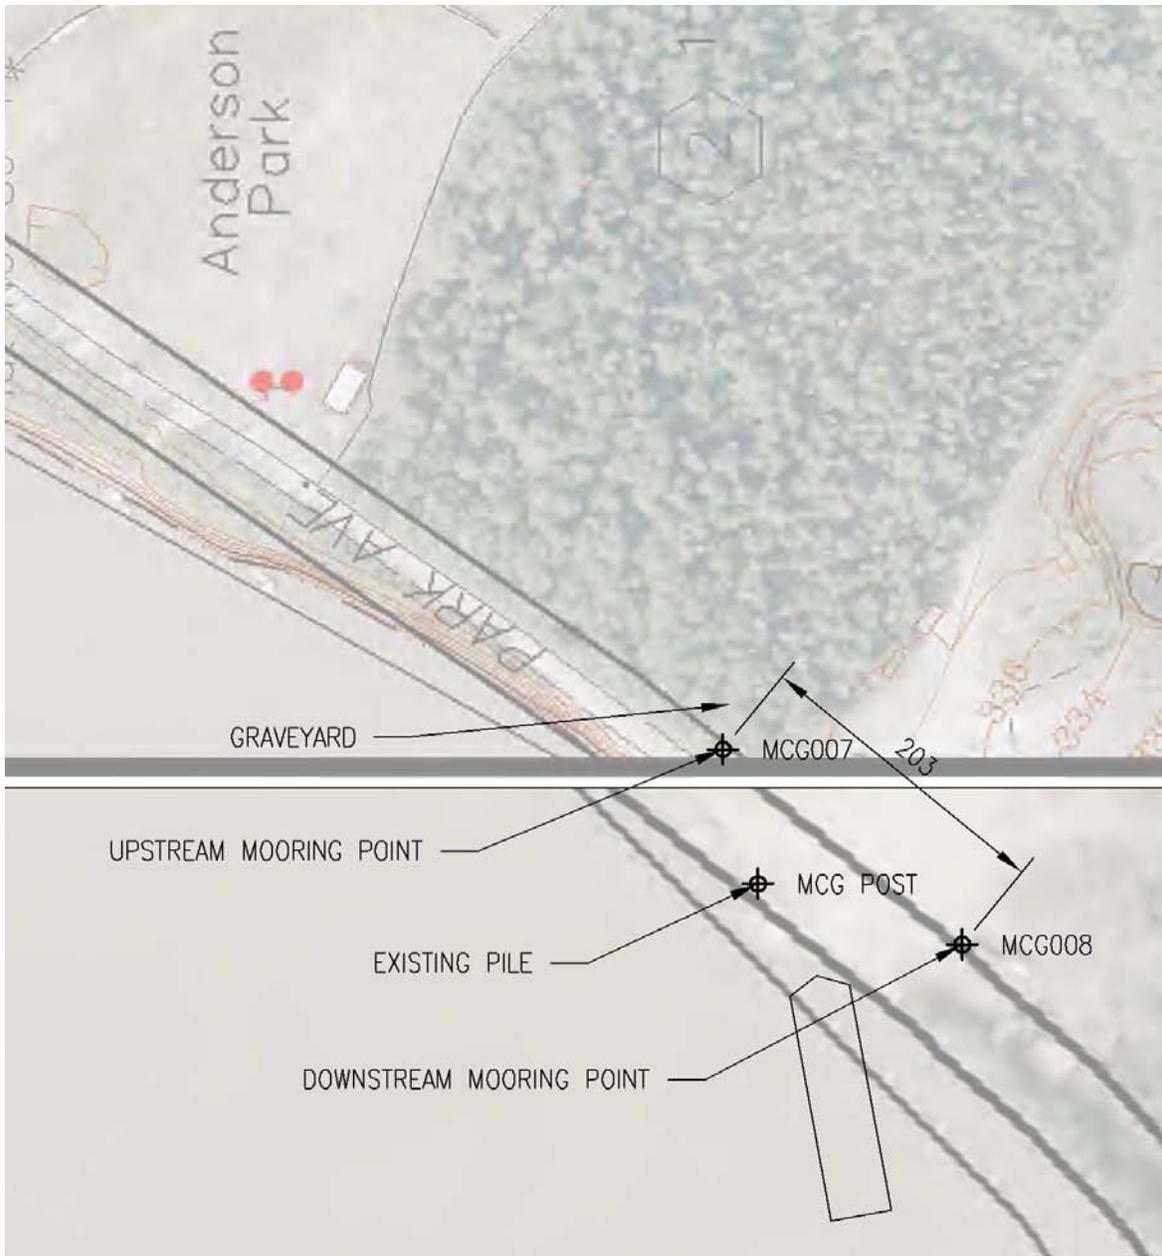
Freight Landing Site and Proposed Mooring Point Locations.
